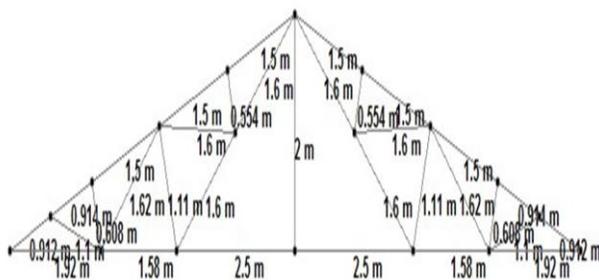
Dimensions of the industrial truss modeled in STAAD-Pro
